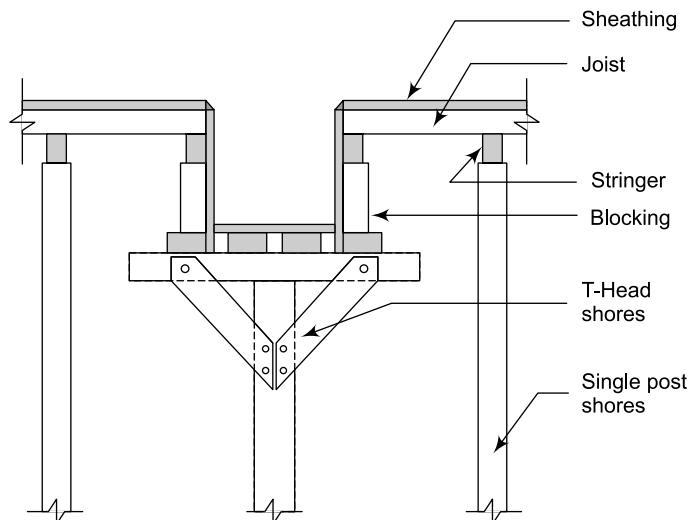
Typical Slab Form Resting on Beam Ledger and Stringers.
